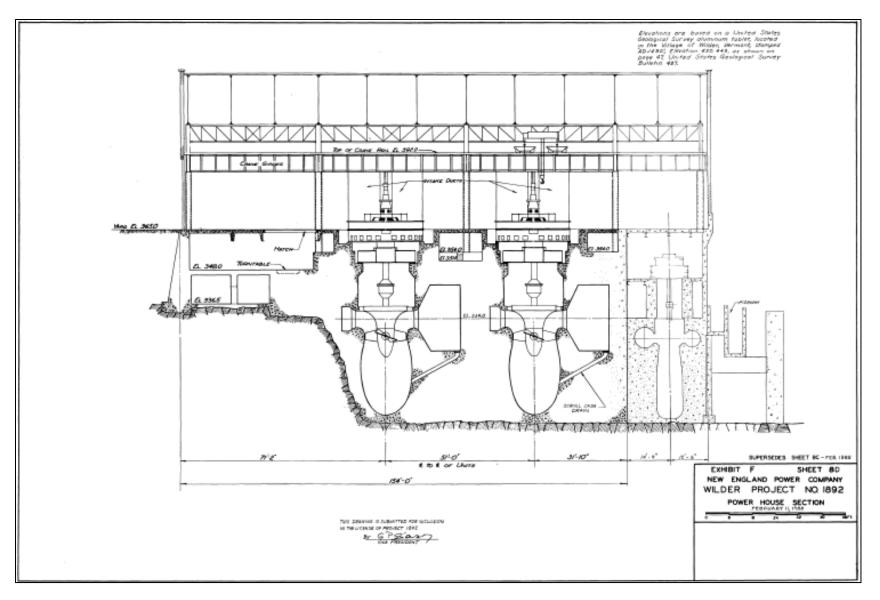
Powerhouse cross section (Units No. 1 and 2).
